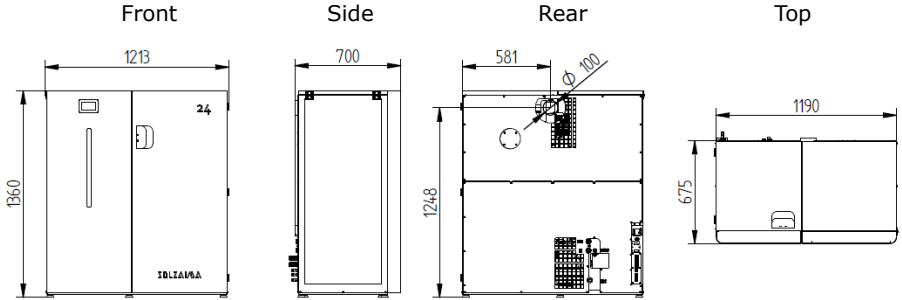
B - Dimensions of the SZM A PLUS 24 kW boiler (NS≤01-25-00101)
